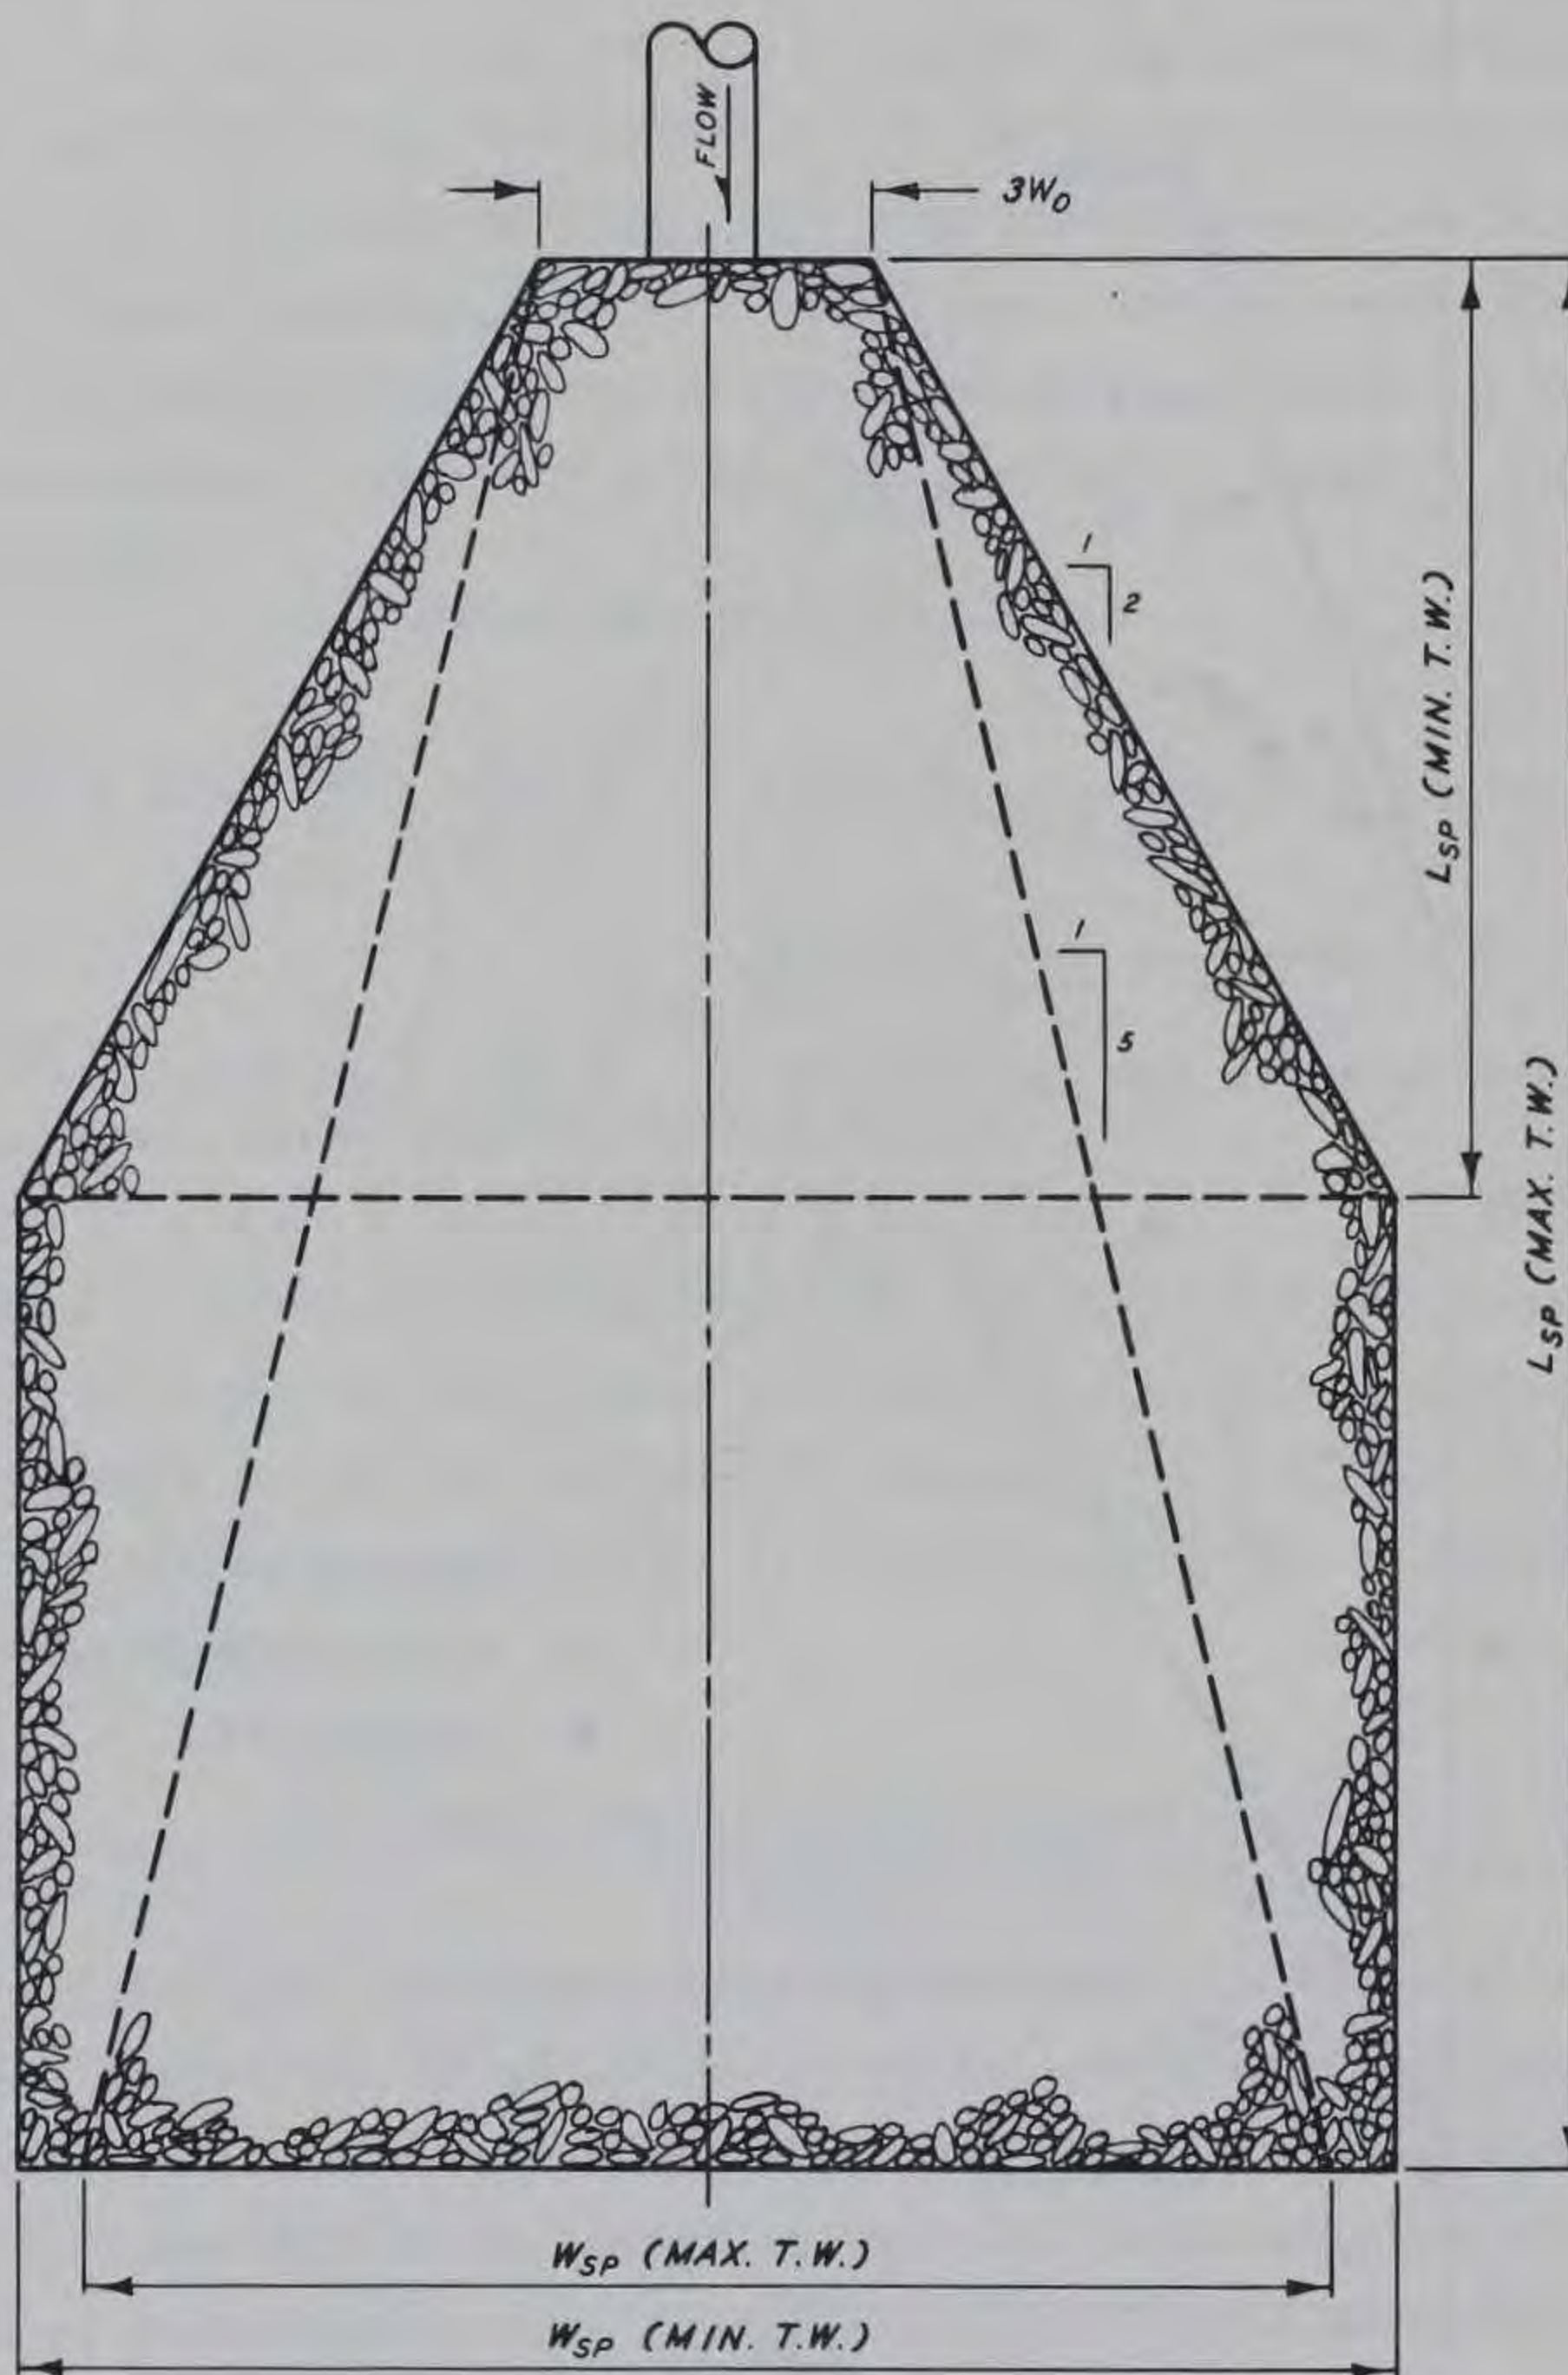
Recommended configuration of riprap blanket subject to minimum and maximum tailwaters
